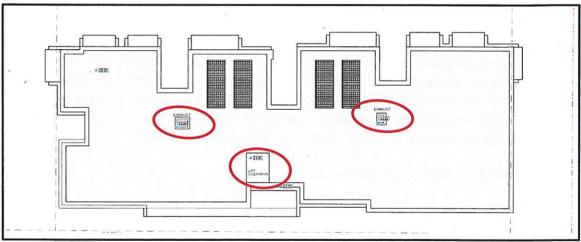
EXCERPT OF RFB BUILDING ROOF PLAN SHOWING VENTS AND LIFT OVERRUN (SOURCE: POPOV BASS)
